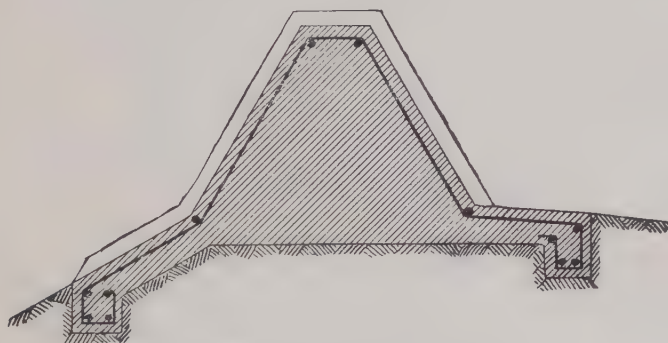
Reinforced Concrete Coaming for Sea-walls
